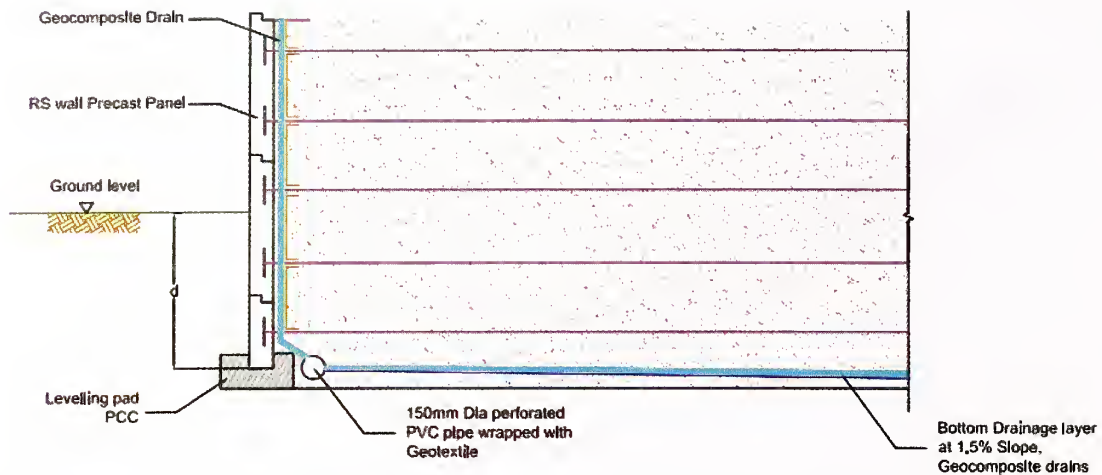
(b) Drainage of Reinforced Soil Wall/Slope
